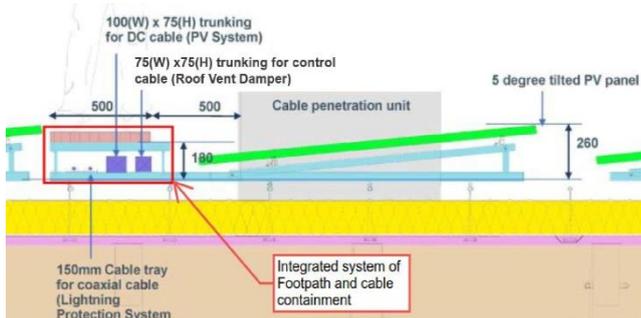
Arrangement of PV Panel and Integrate System of Foot Path and Cable Containment on Station Roof (Section View)
